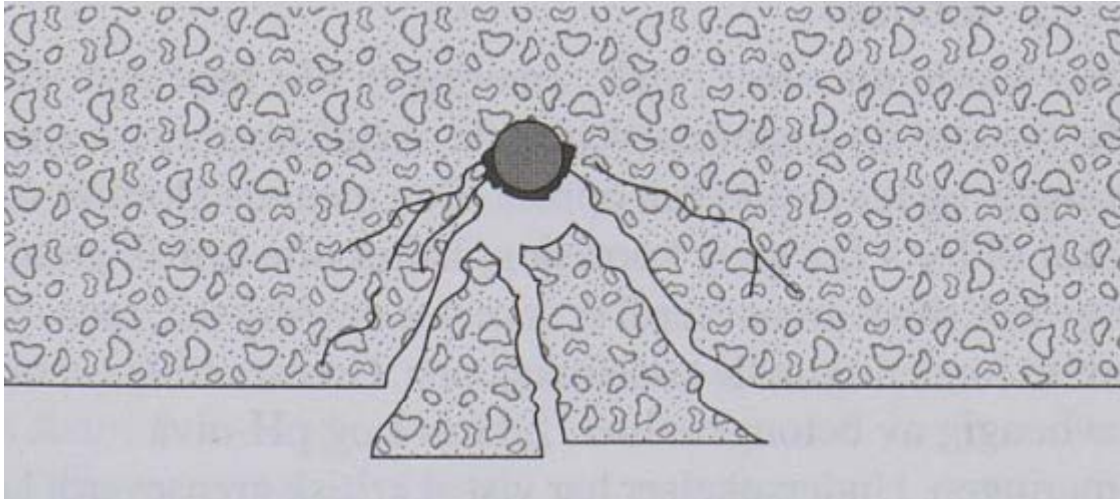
concrete spalling due to rust (Bernt Kristiansen 1998).
